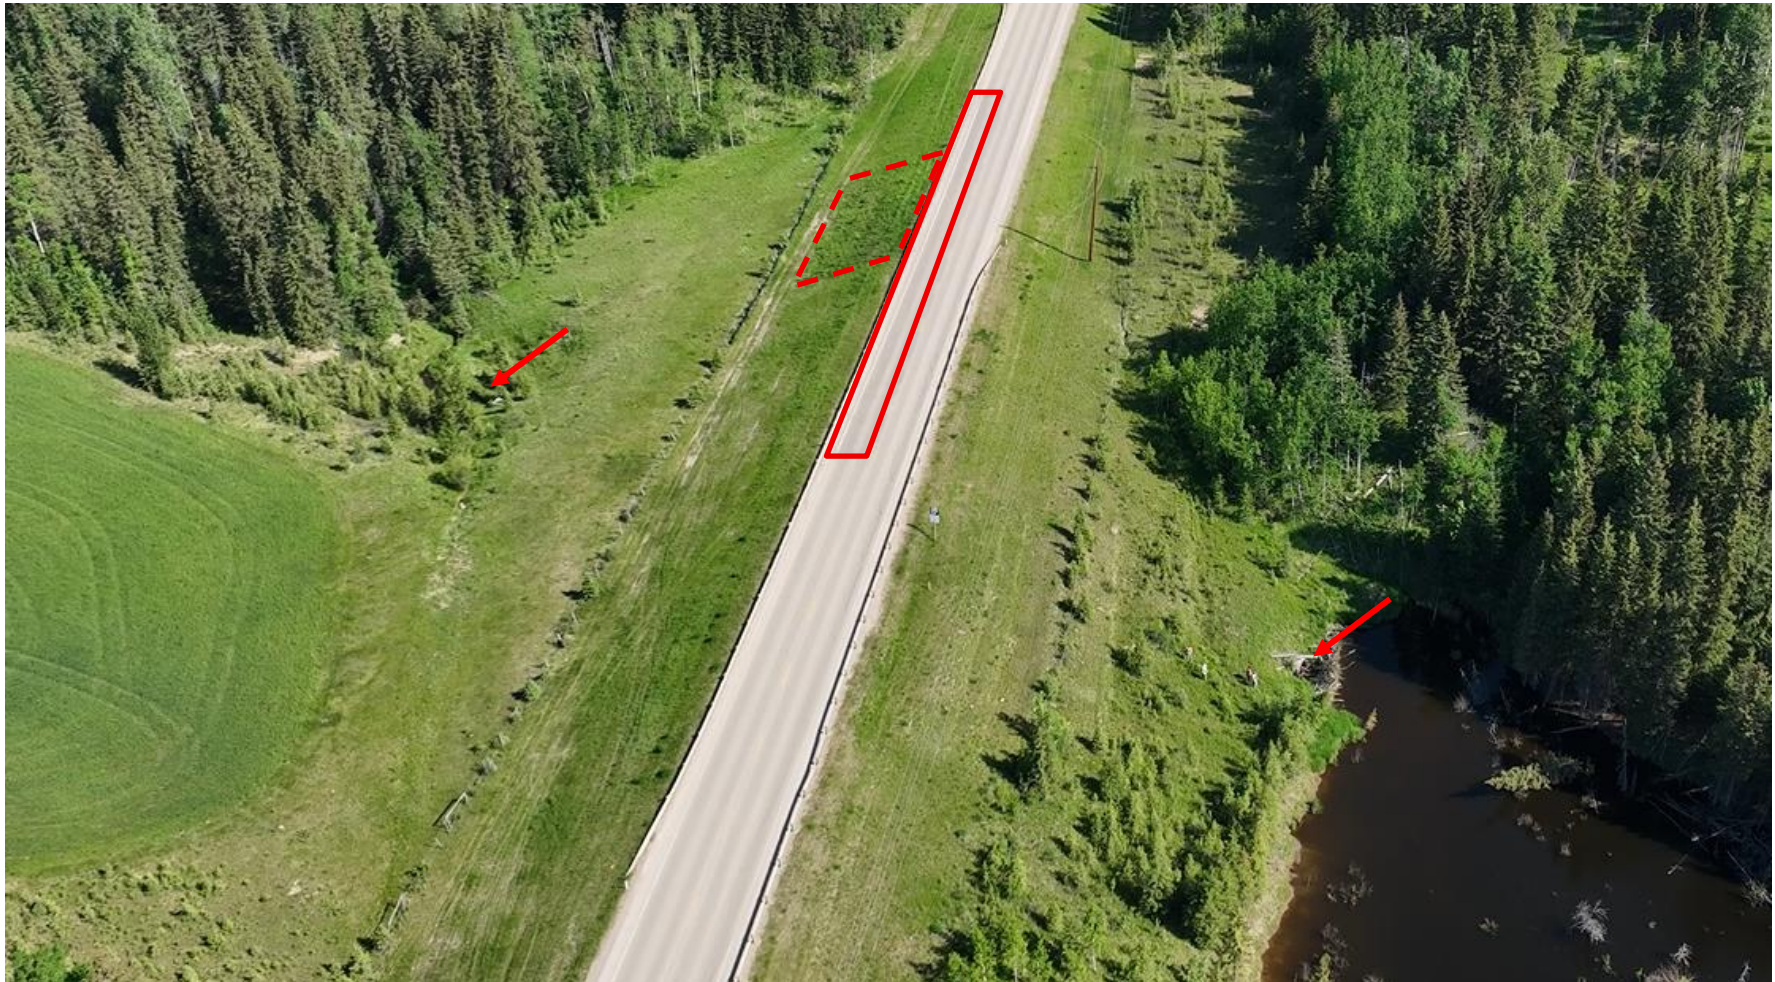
Guardrail and pavement patch in west (southbound) lane. Red diamond hazard sign indicated by red arrow. Photo taken June 9 2025 facing south.
